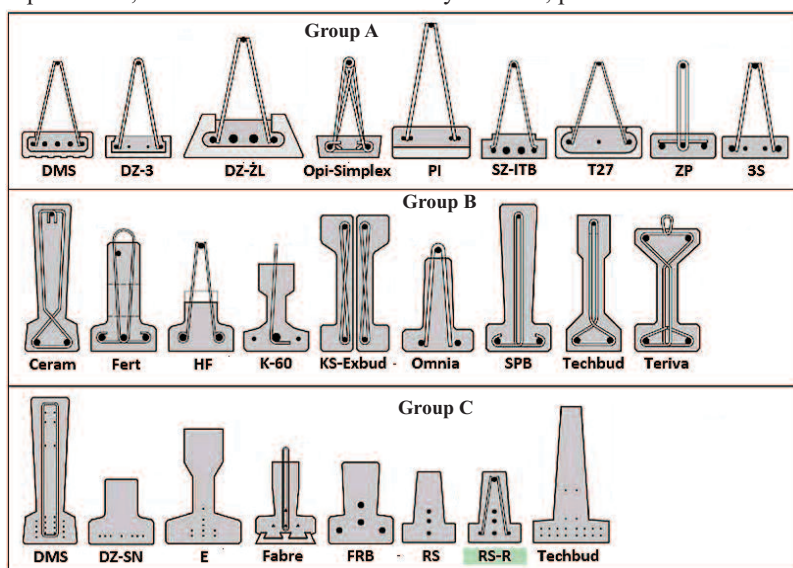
Types of precast beams used in densely ribbed ceilings: Group A – reinforced concrete beams; Group B – truss beams; Group C – prestressed beams (this group includes the RS139 prestressed concrete beam subjected to analysis)
